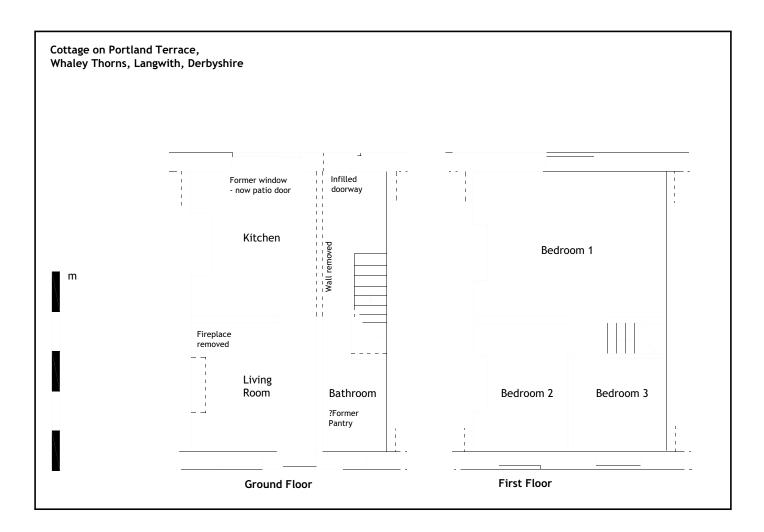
Floor plans of one of the cottages on Stone Row, Portland Terrace, Whaley Thorns. Not to scale.
